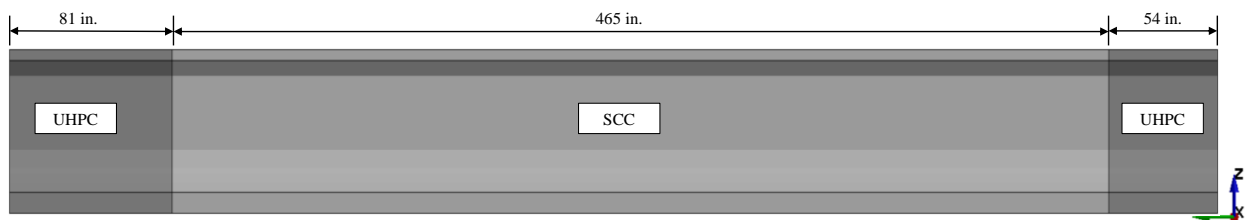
Overview of the UHPC-SCC hybrid girder model
